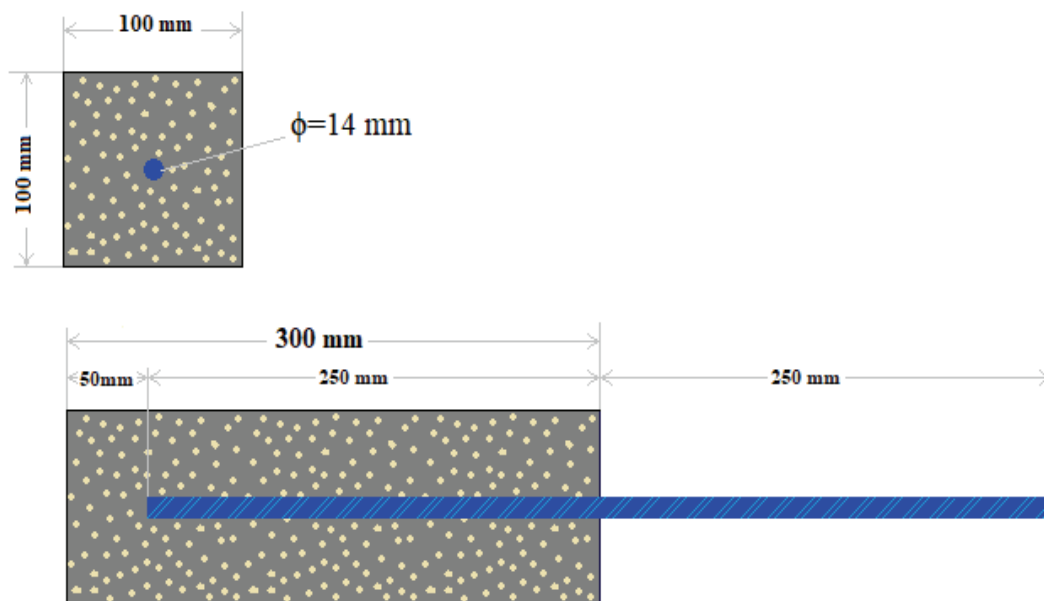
Preparation of specimens for testing adhesion of cement reinforcement
